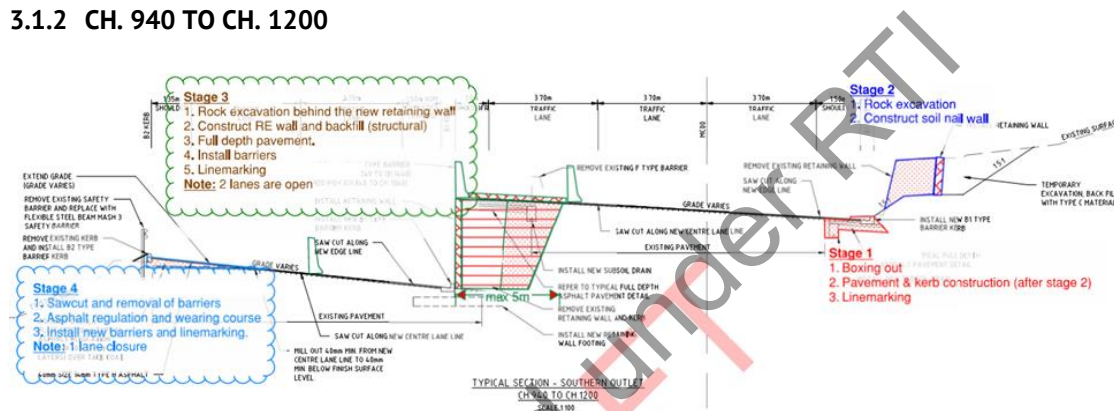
Typical section – Southern Outlet Ch. 940 to Ch. 1200
